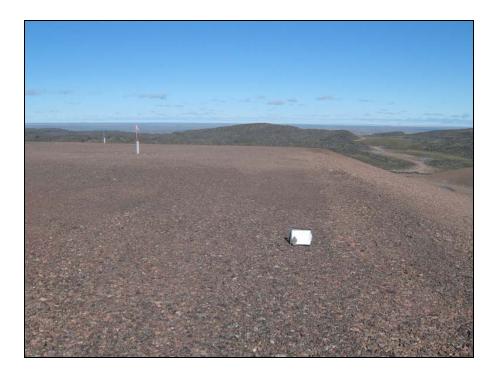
South slope from southeast toe facing west. Some seepage from south slope and minor ponding at toe. No staining. ↑
